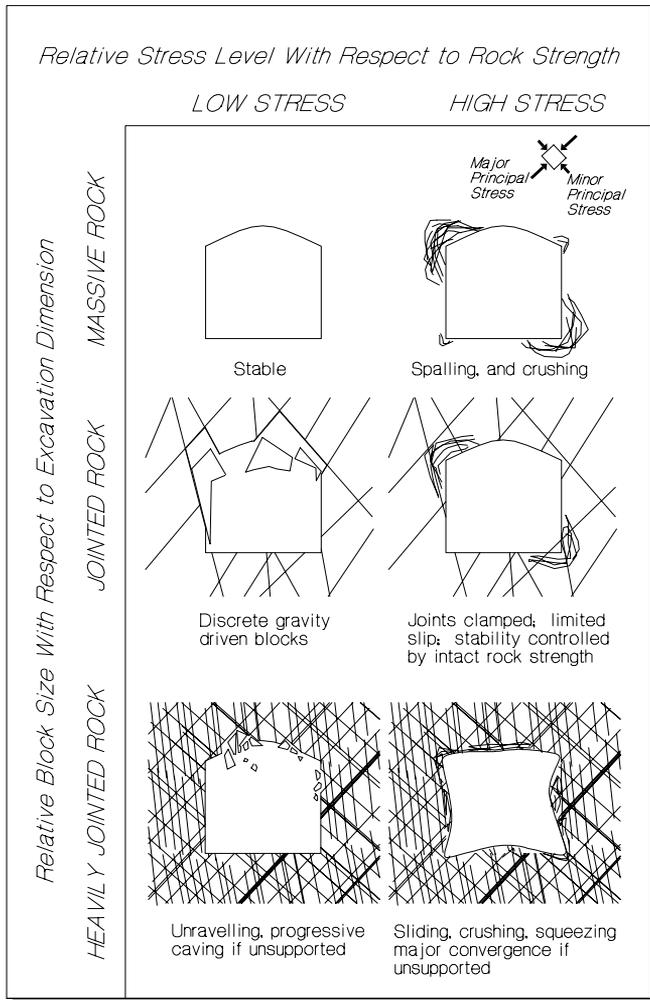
Stress, structural integrity and failure modes (after Hoek et al., 1995)
